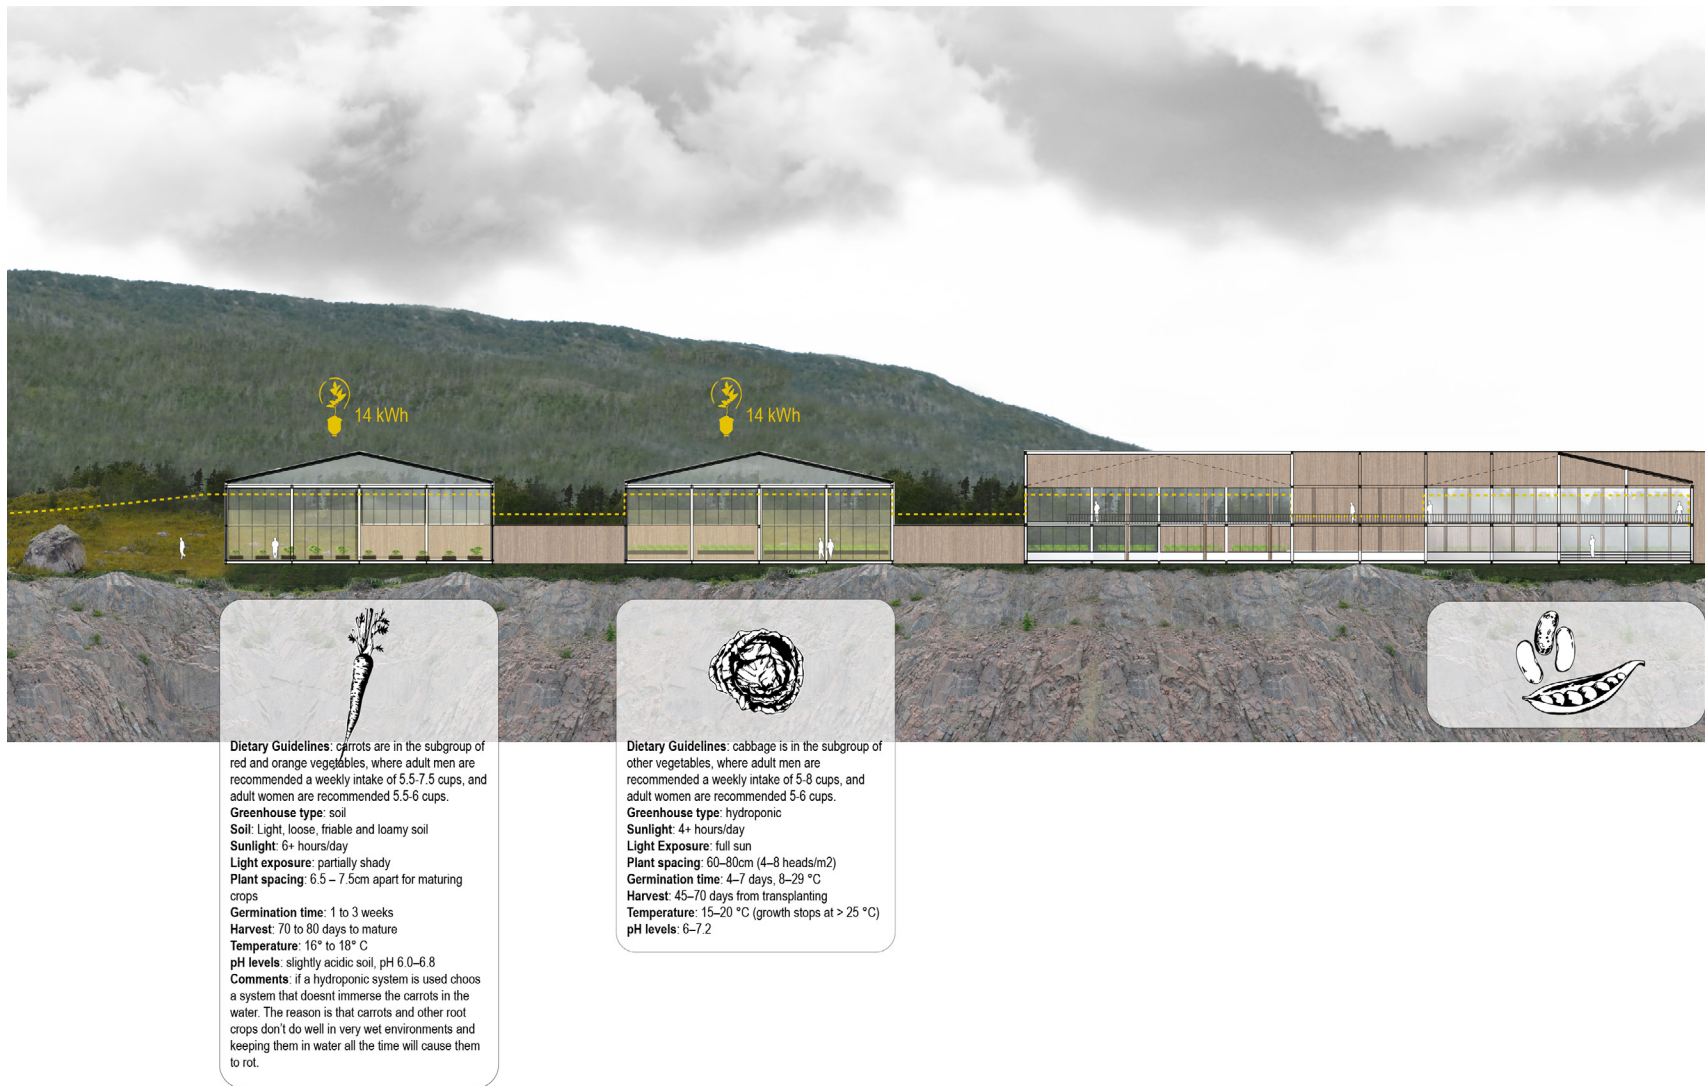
Section 2: section through the hydroponic greenhouses, sky-pathway, conference room, community greenhouse, and education rooms
